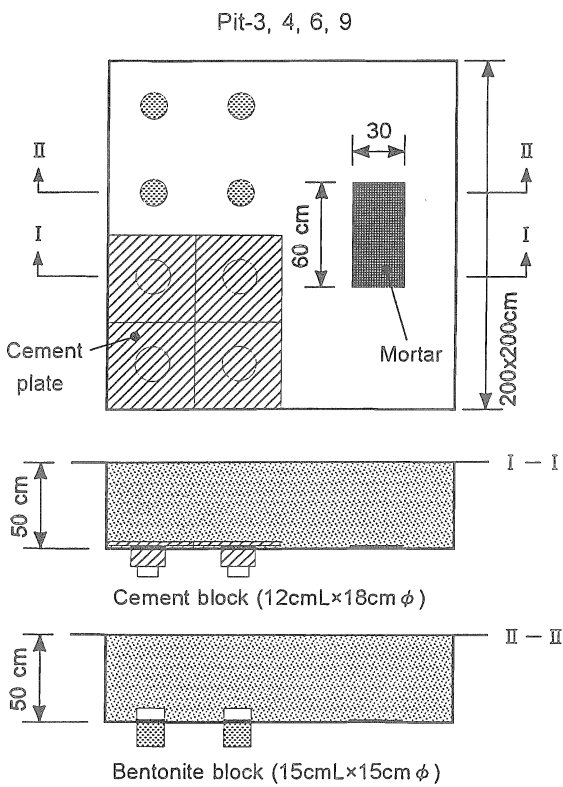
Cross-sectional view of the pit for engineered barrier material.
